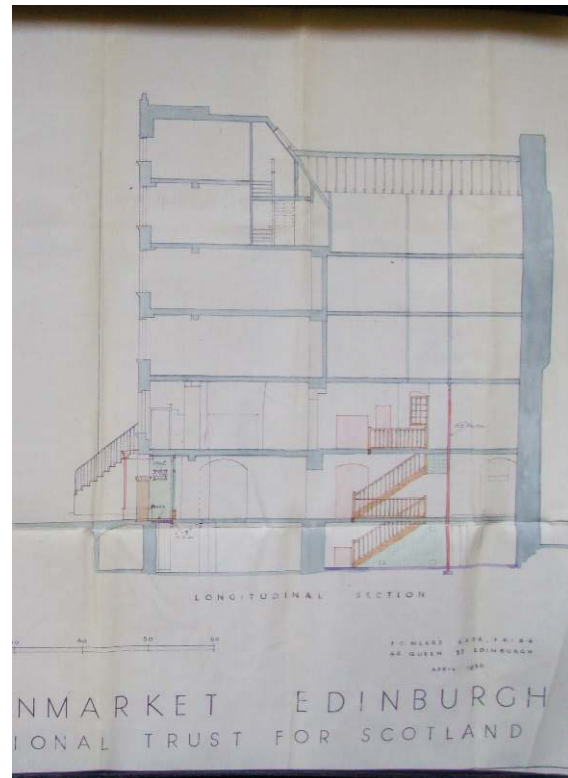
N-S section showing warranted scheme of 3rd June 1938. This drawing shows that some of the 1936 works had been carried out, and are not marked as new. City of Edinburgh plan store
